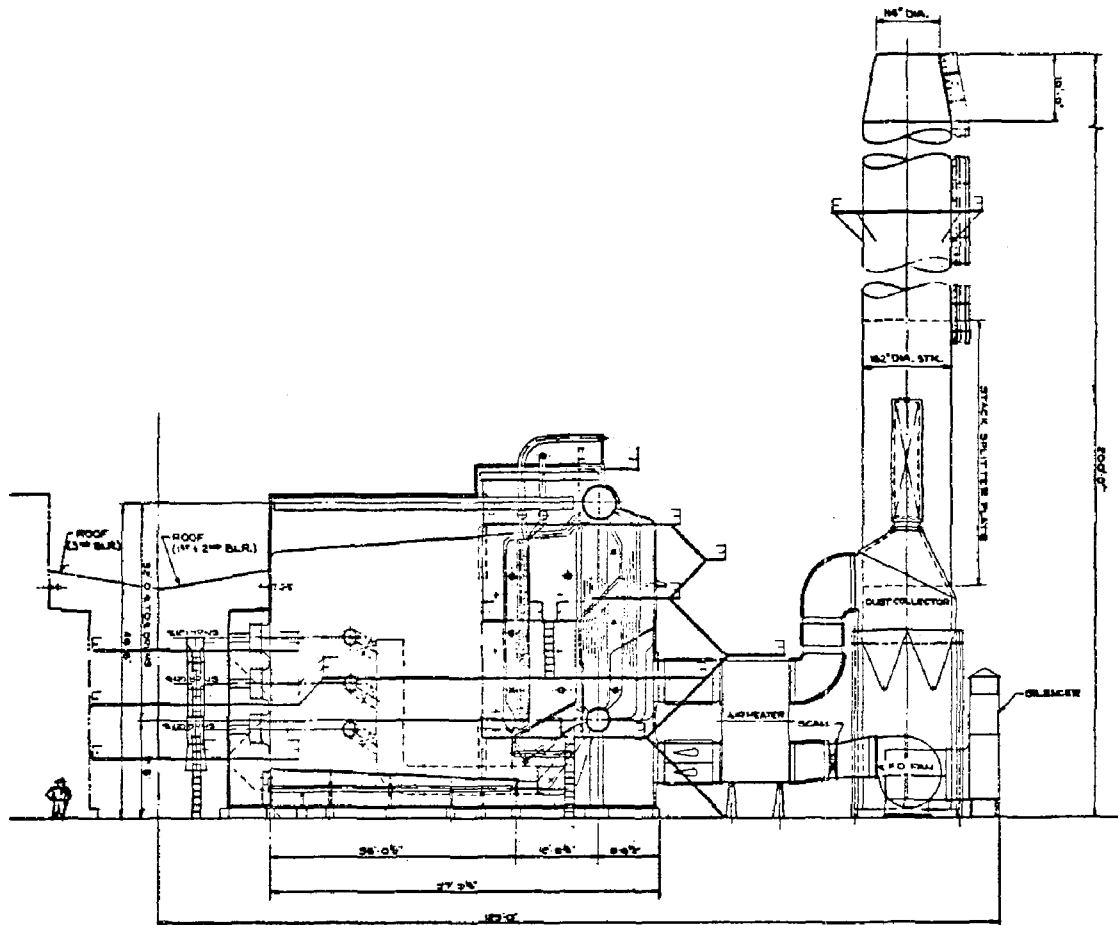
Typical Arrangement of Boiler and Auxiliary Equipment
